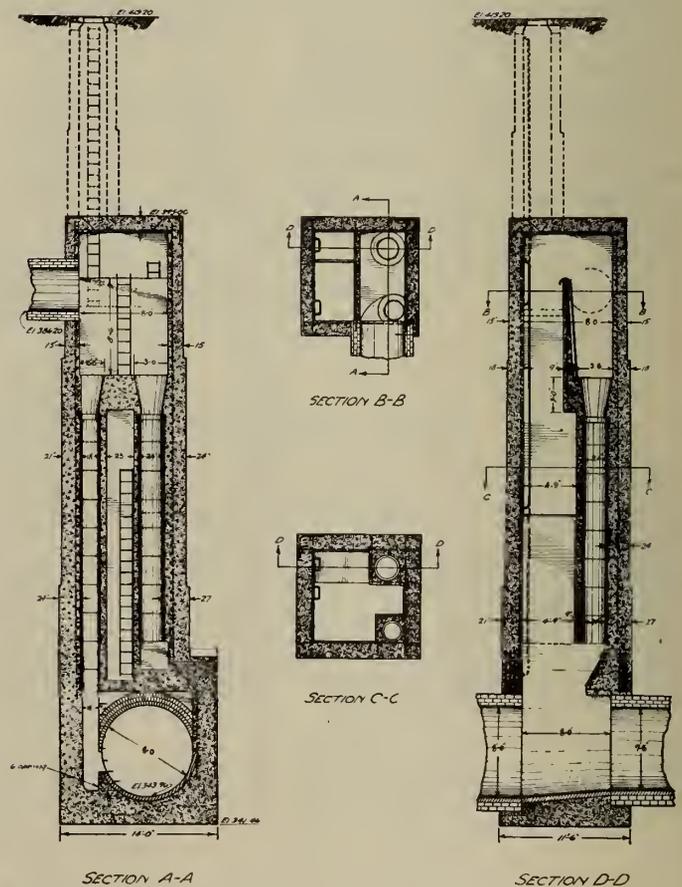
Drop Manhole on Cadorna Avenue Trunk Sewer.
